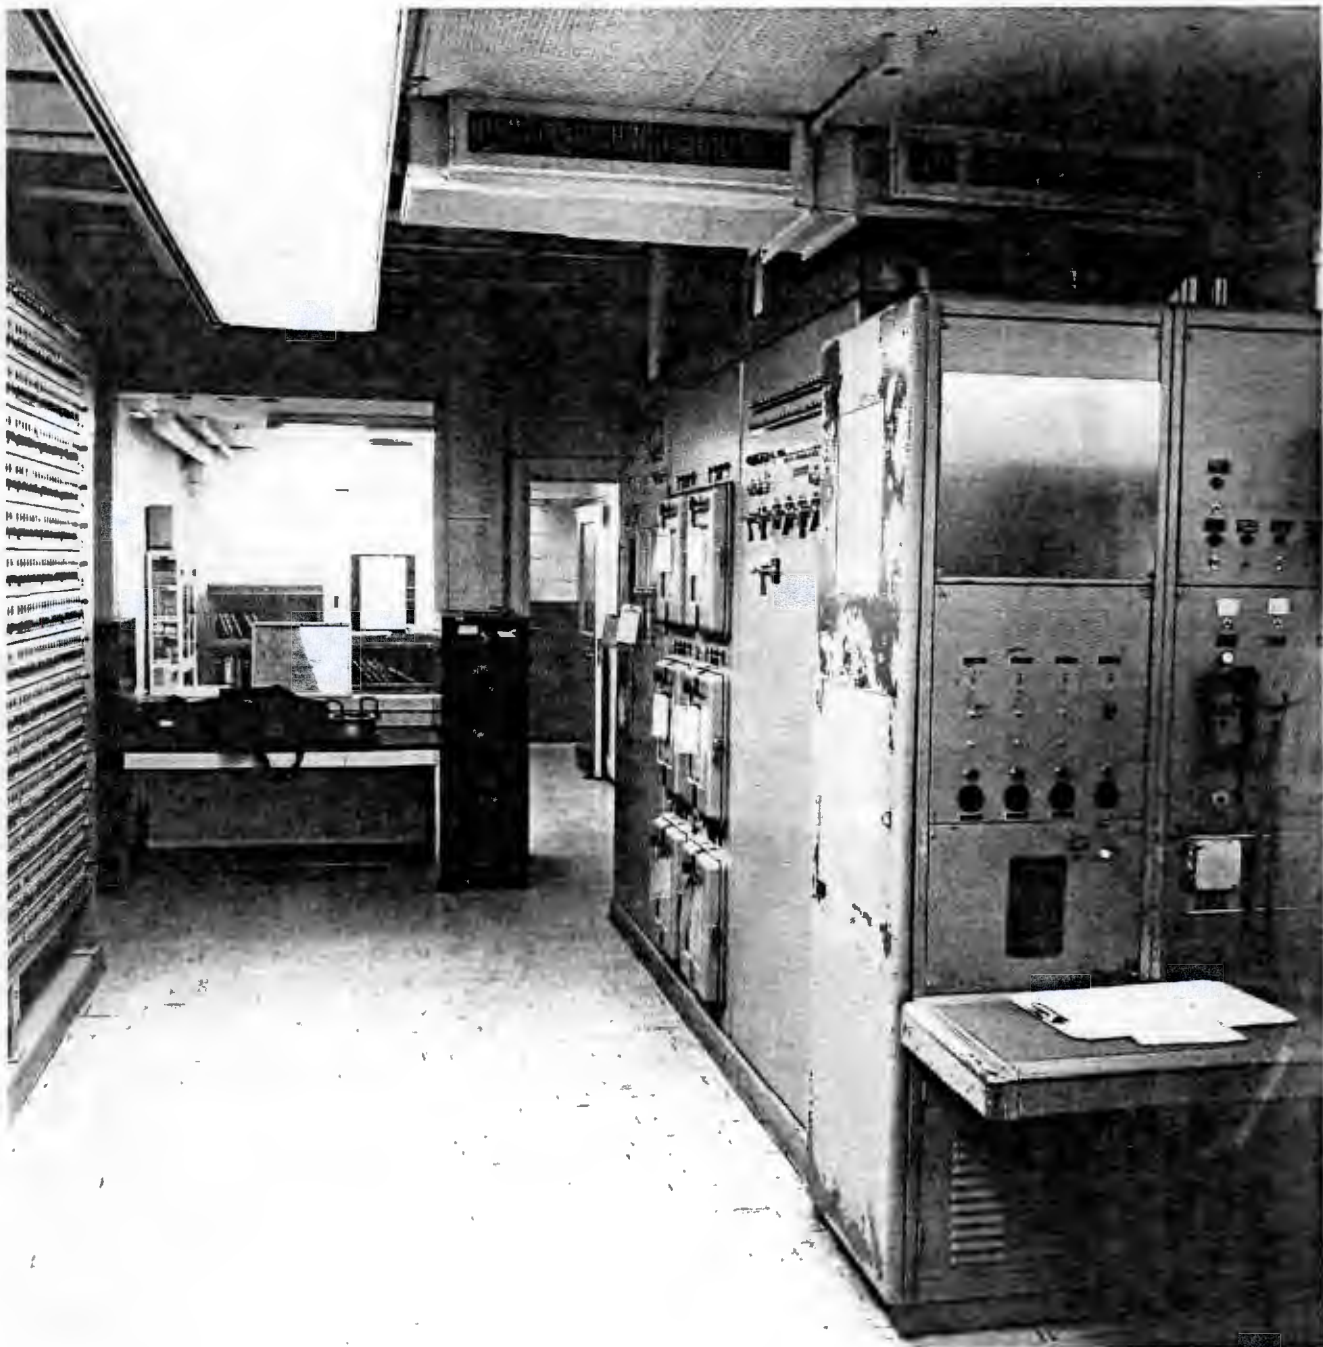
Wood Covers Over the Stack Plenum Openings.
